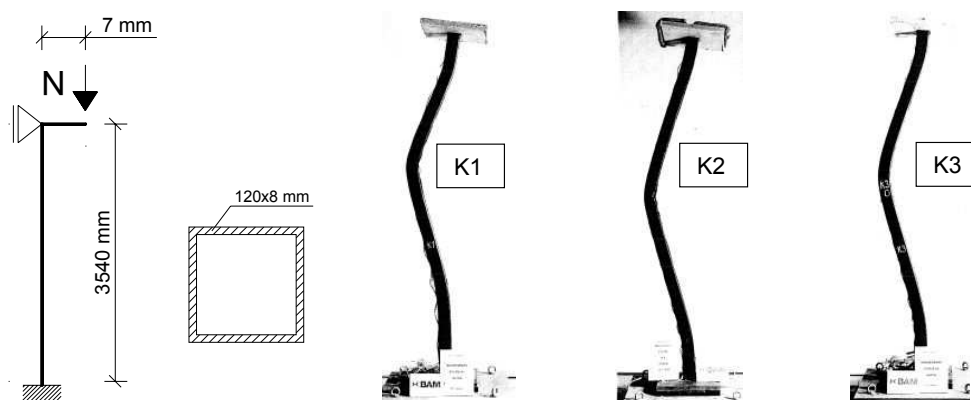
Static system and cross-section of the columns tested in Berlin (left); deformed columns K1 to K3 after test and cooling.
